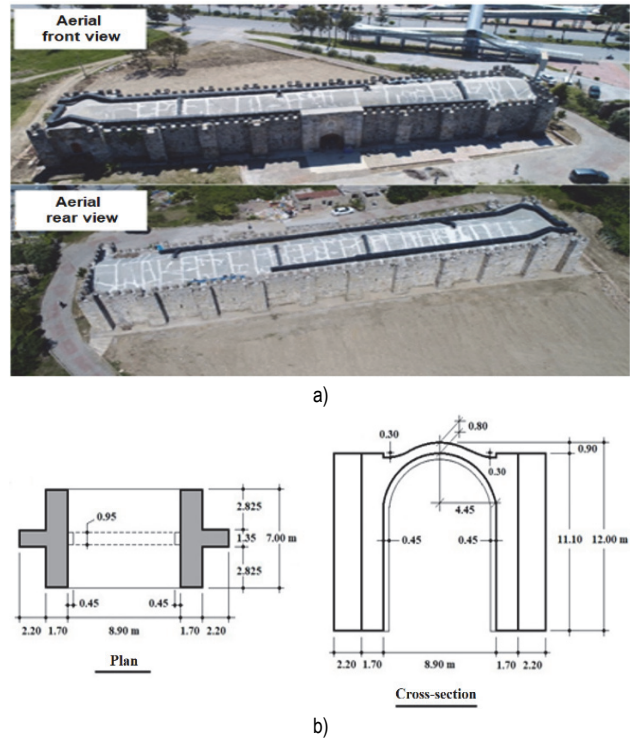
a) Views of Şarapsa Han, b) Plan and cross-section of the basic model (drawings are not to scale)
